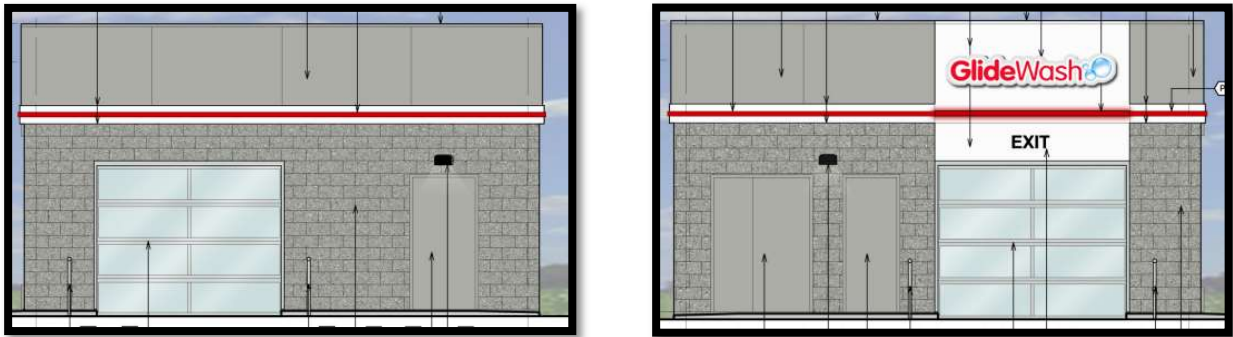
Exhibit S: East Elevation (L) and West Elevation (R) of Car Wash
